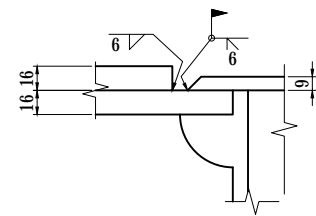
# DETAIL OF MAIN GIRDER STANDARD (7) S=1:20
